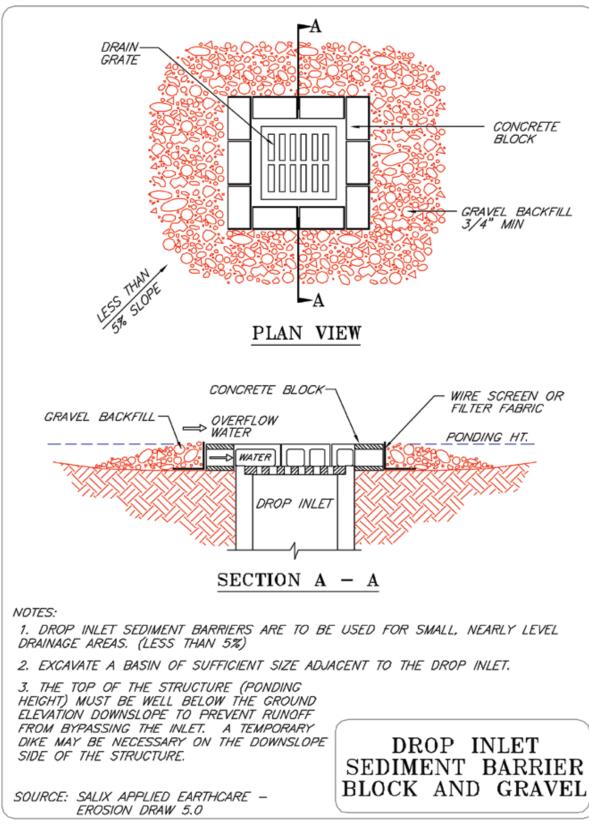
Block and Gravel Drop Inlet Protection *Kentucky Construction Site BMP Planning and Technical Specifications Manual
